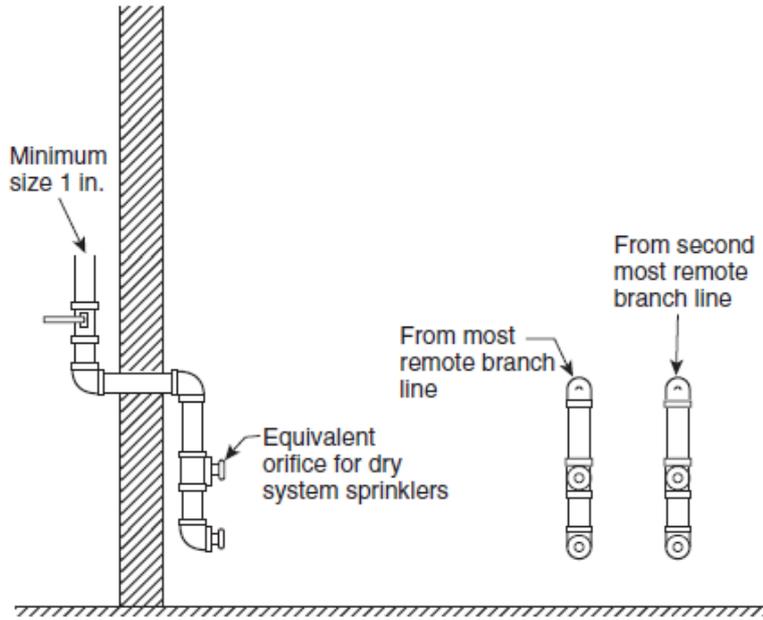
Example Manifold Arrangement (Four Sprinklers).
